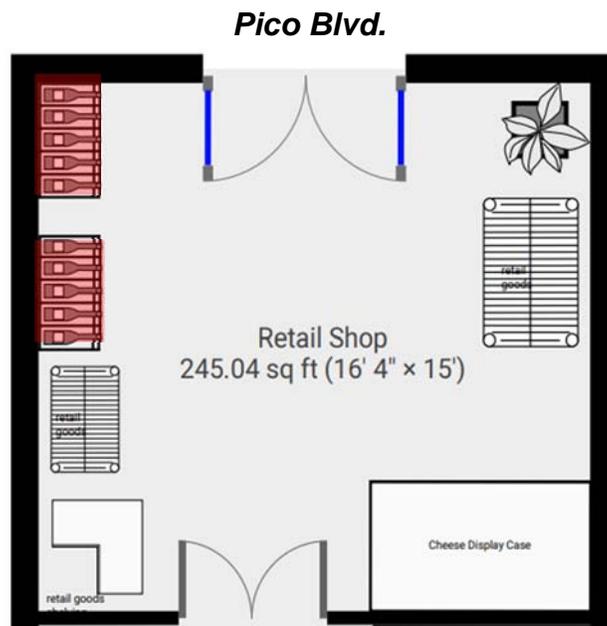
Proposed Floor Plan (Showing Retail Space Only)
